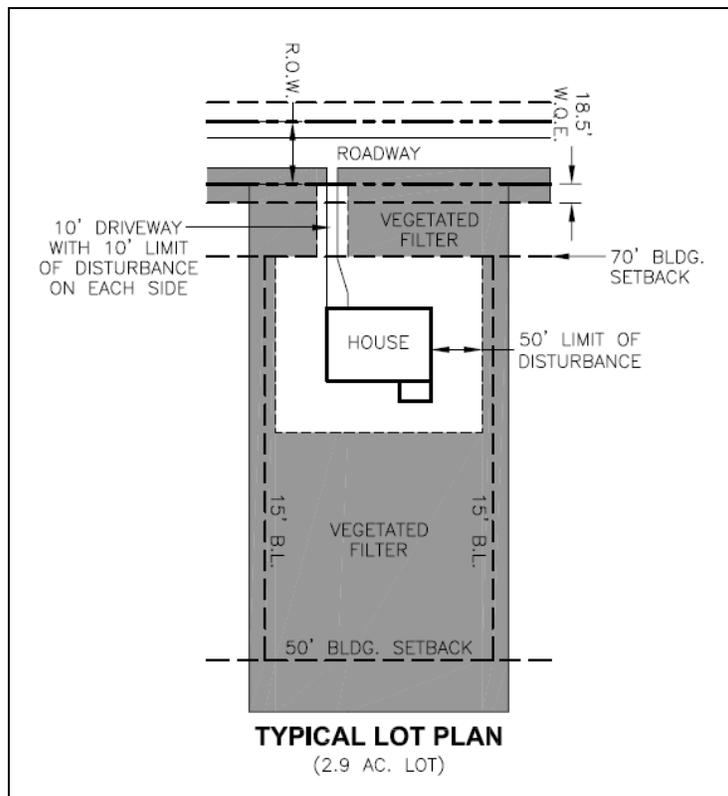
Detail of Lot Layout with Water Quality Easements
